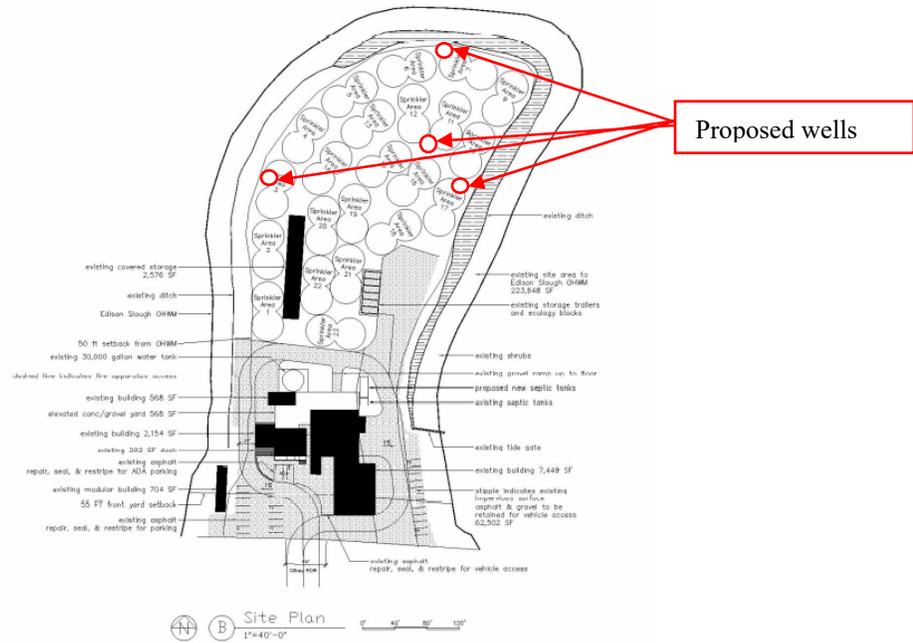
Site plan from permit fact sheet with approximate proposed well installations.
